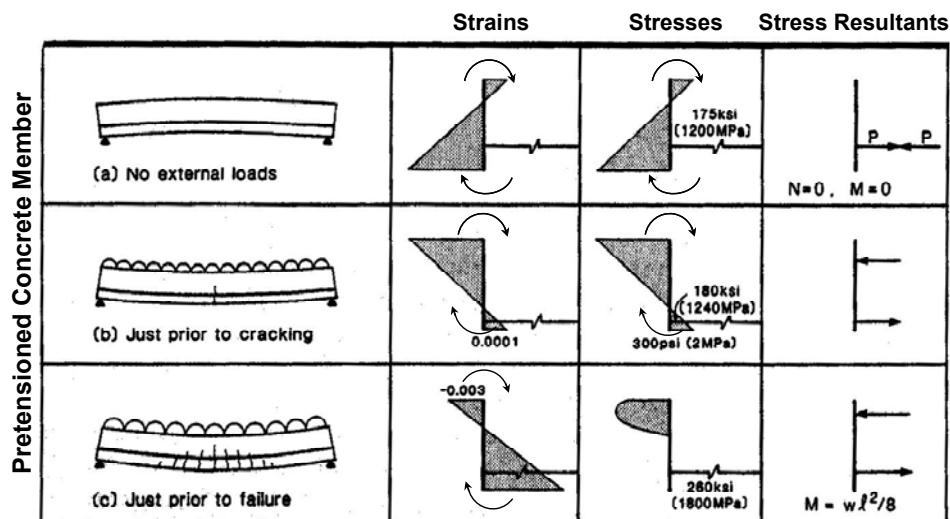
Behavior of a pretensioned concrete beam. (Collins and Mitchell 1997)
